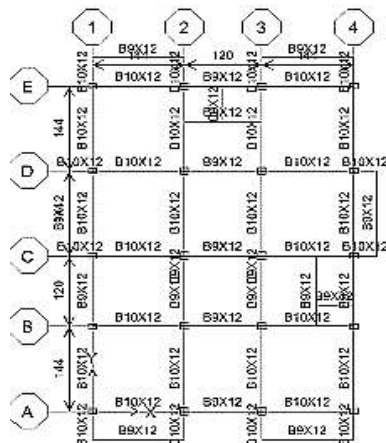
Typical beam section plan of proposed building for T-2 (in)
